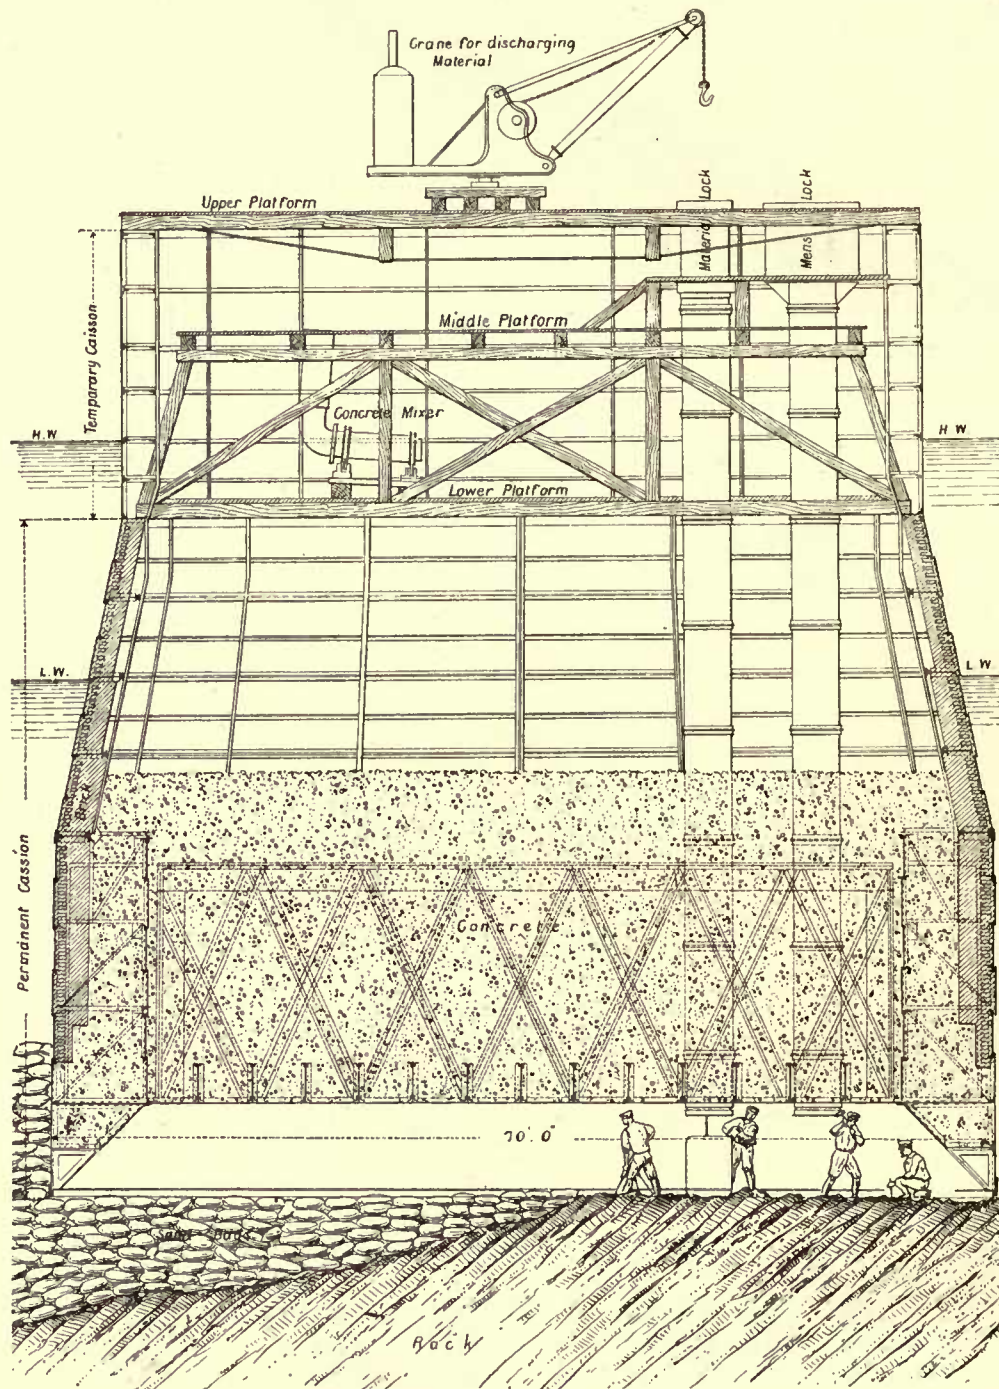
SECTION OF CAISSON AT INCHGARVIE.
